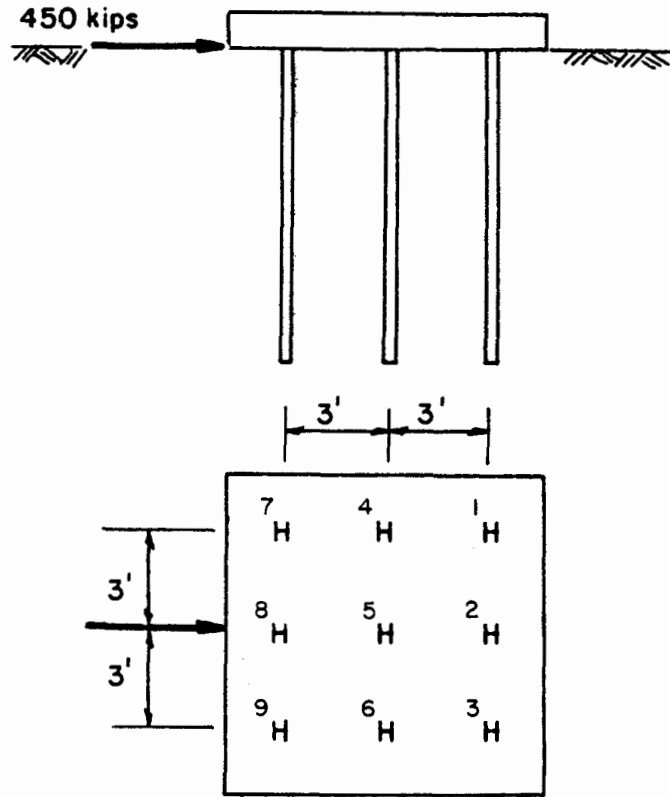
Plan and elevation of foundation analyzed in example problem.
